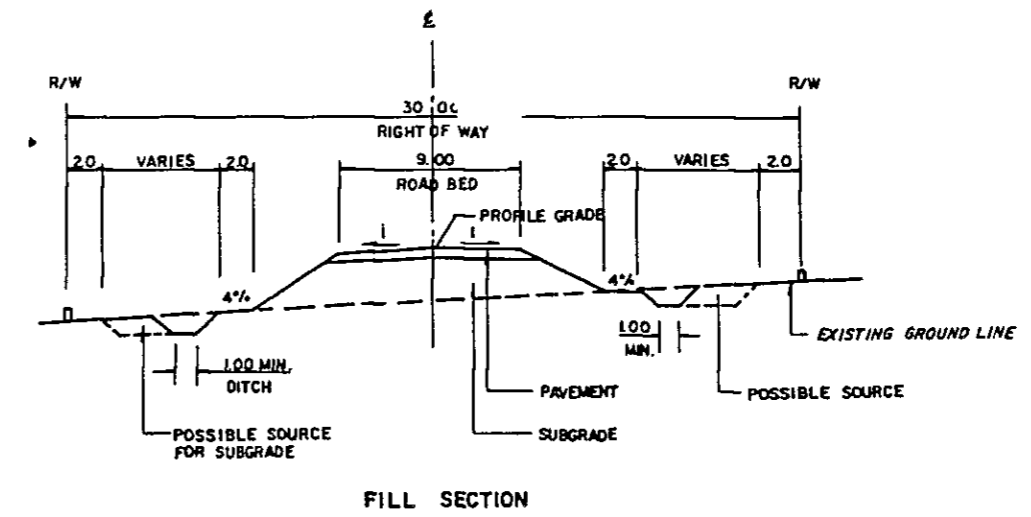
TYPICAL CROSS SECTION AND TYPICAL PAVEMENT STRUCTURE
